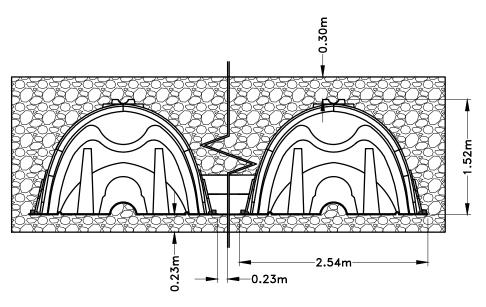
UNDERGROUND STORMWATER STORAGE DETAIL
